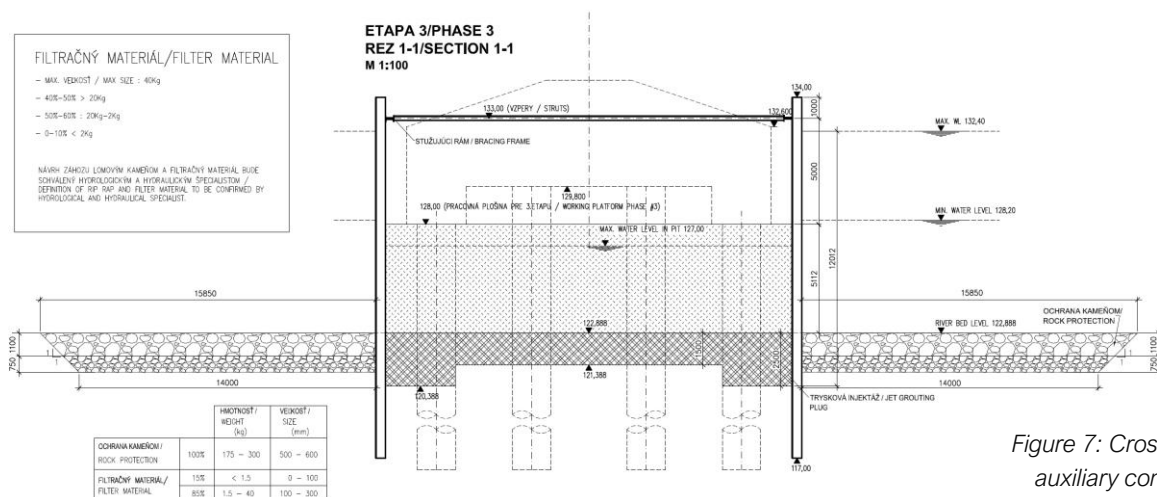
Cross section of the auxiliary construction pit, bracing frames, drilled piles and jet grouting plug for the Danube pier E3
